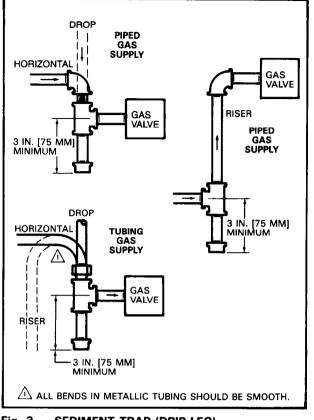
SEDIMENT TRAP (DRIP LEG) INSTALLATION.
